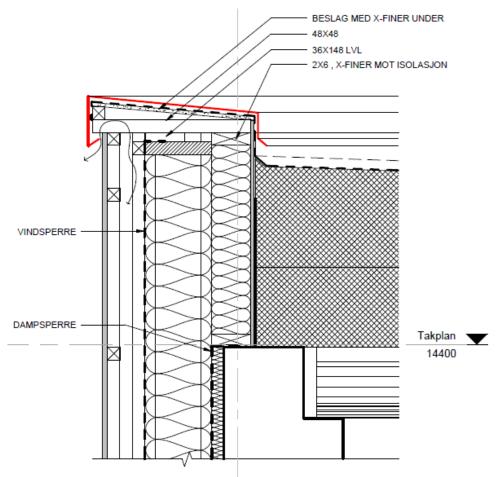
Details of the parapet. Illustration: ABO Plan og Arkitektur.
